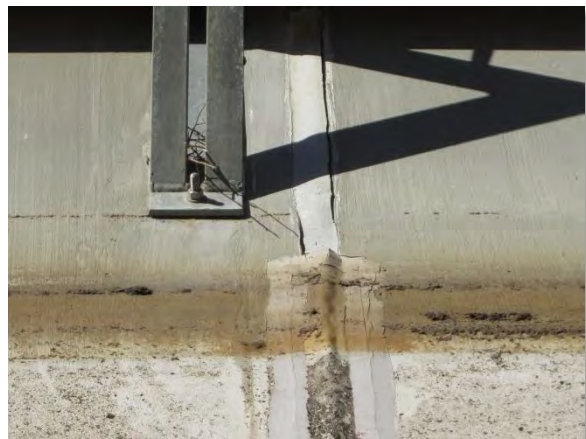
Typical sealant in expansion joint with shrinkage and gaps.
